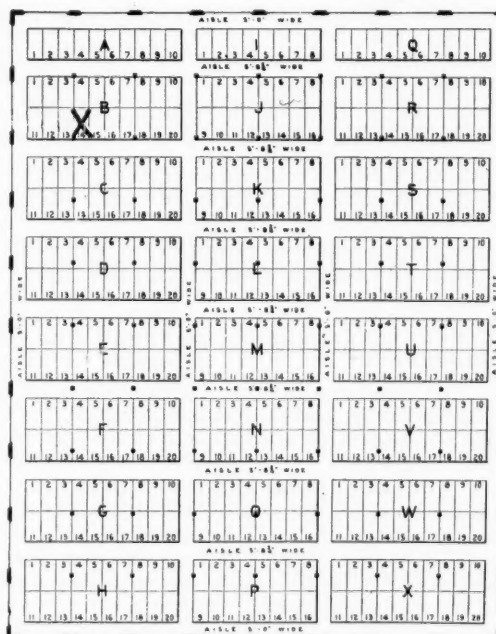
FLOOR PLAN MAIN EXHIBIT BUILDING.
